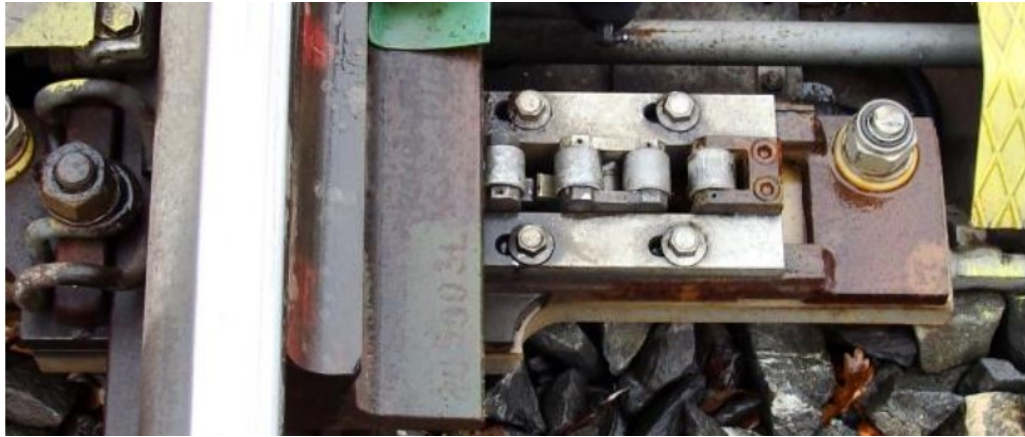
roller stool for the 1st hollow steel bearer, type SVV-ZP
